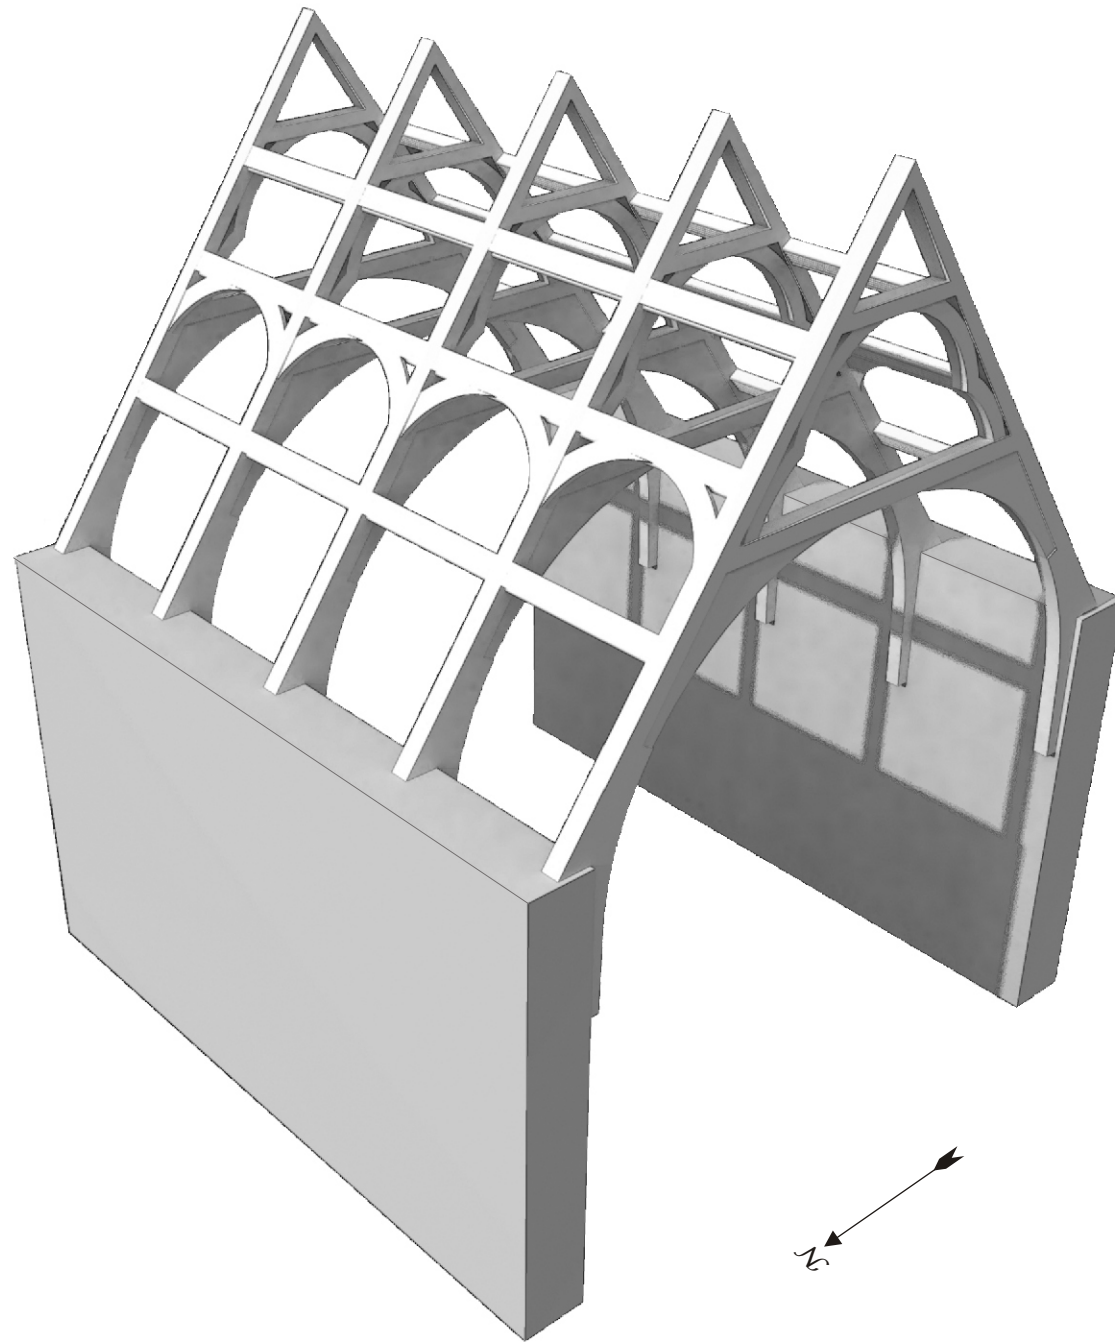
3D reconstruction of Group 1 roof set on chapel walls
